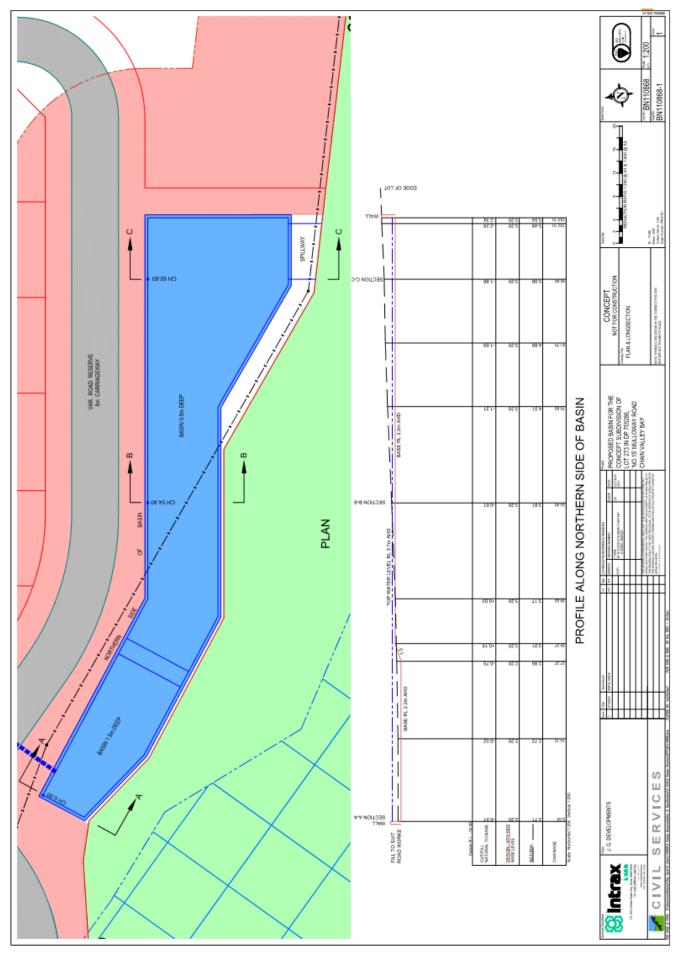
Concept stormwater basin plan and longsection (Source: Intrax 6.10.2021)
